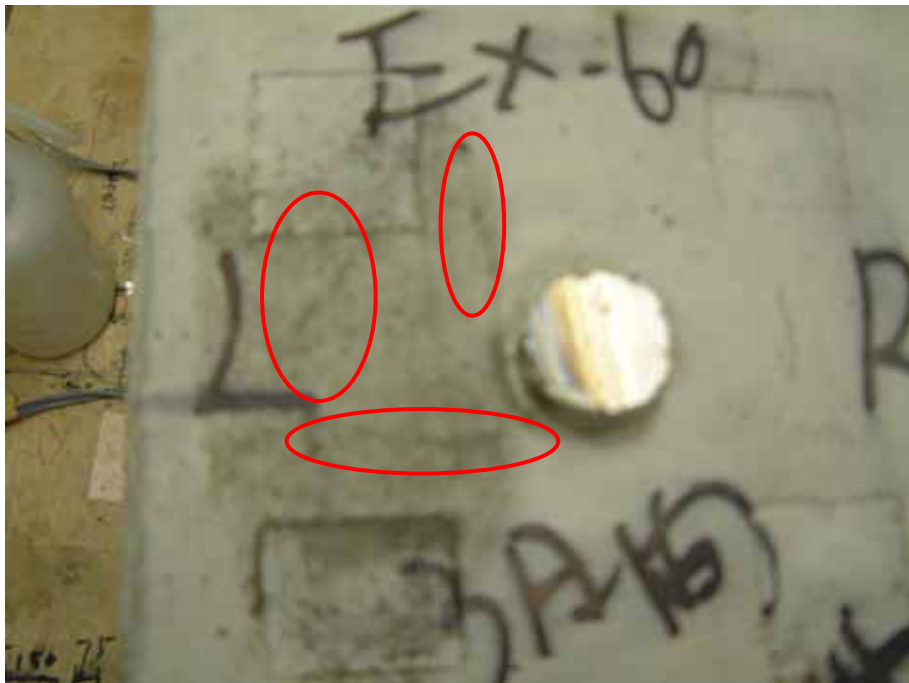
Crack occurred on the surface of sealed-curing specimen due over-expansion (EX66)
